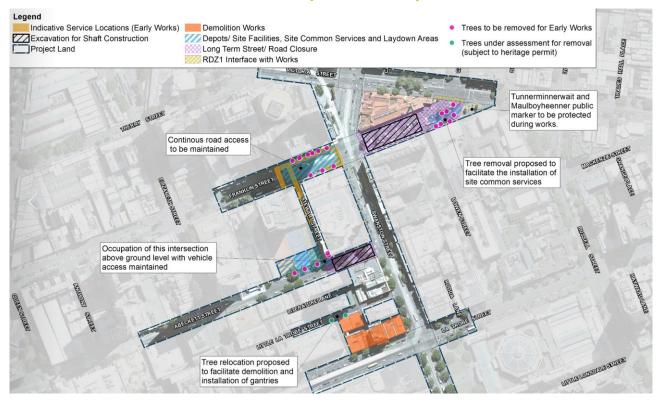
Excerpt from the Site Layout Plan which identifies Early Works within the CBD North Station Precinct (refer to Appendix 1).
